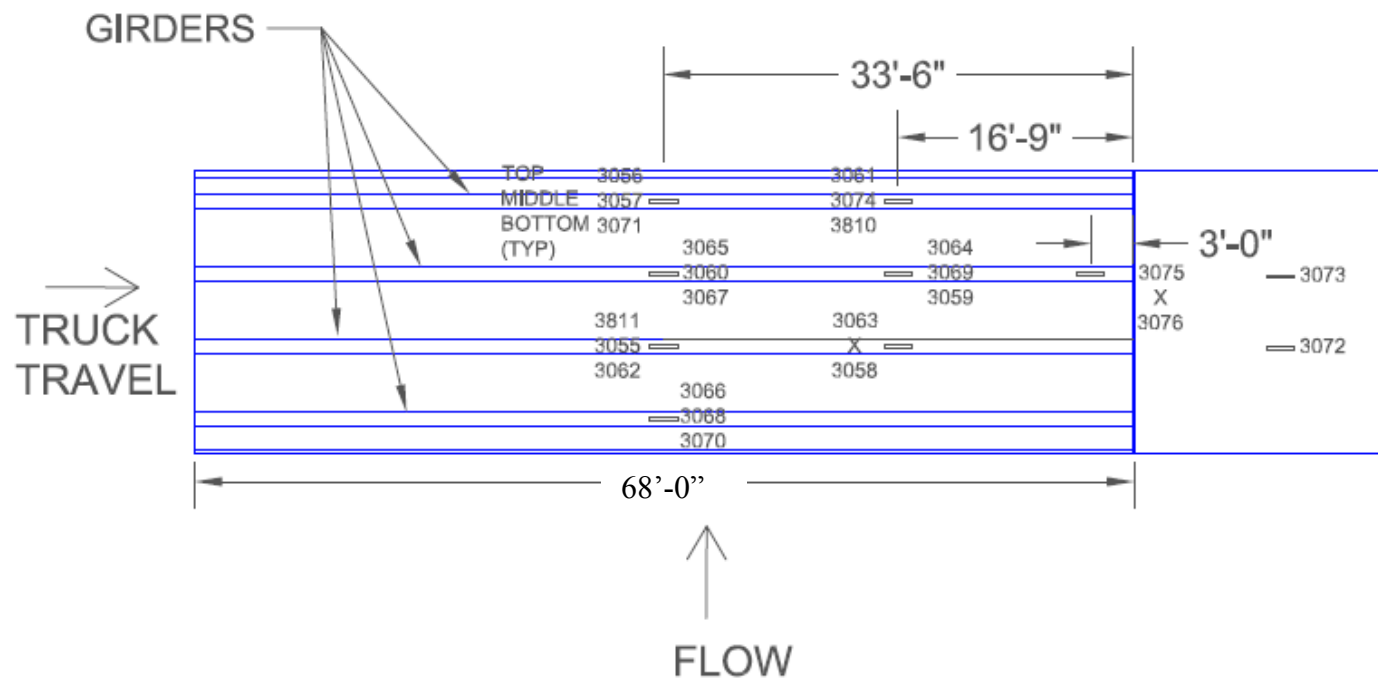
Instrumentation plan view for Bridge No. 5507.
